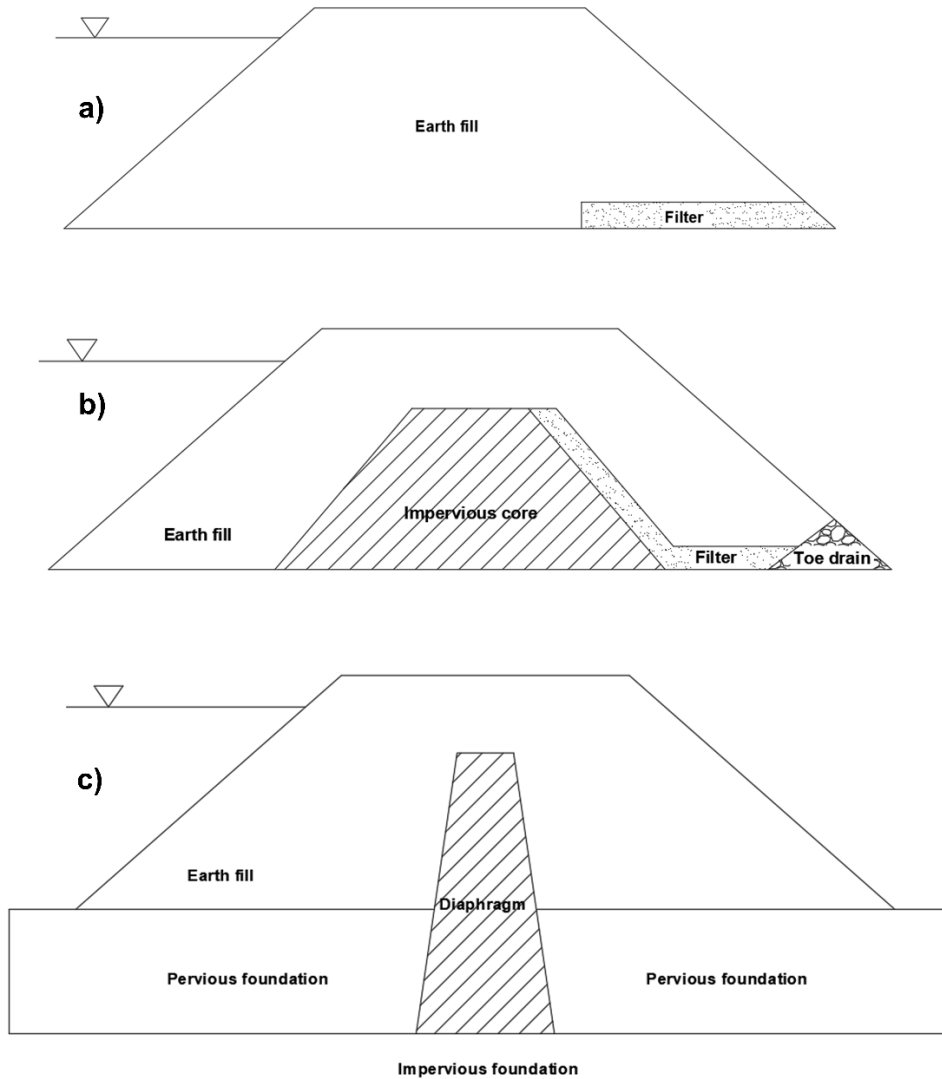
8 a) Homogenous earthen dam, b) Zoned earthen dam and c) Diaphragm-type earthen dam
